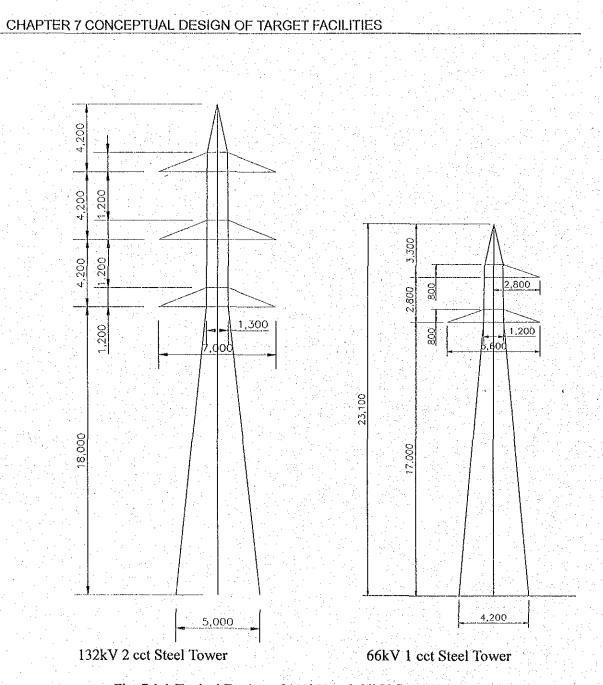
Typical Design of 132kV and 66kV Steel Towers
